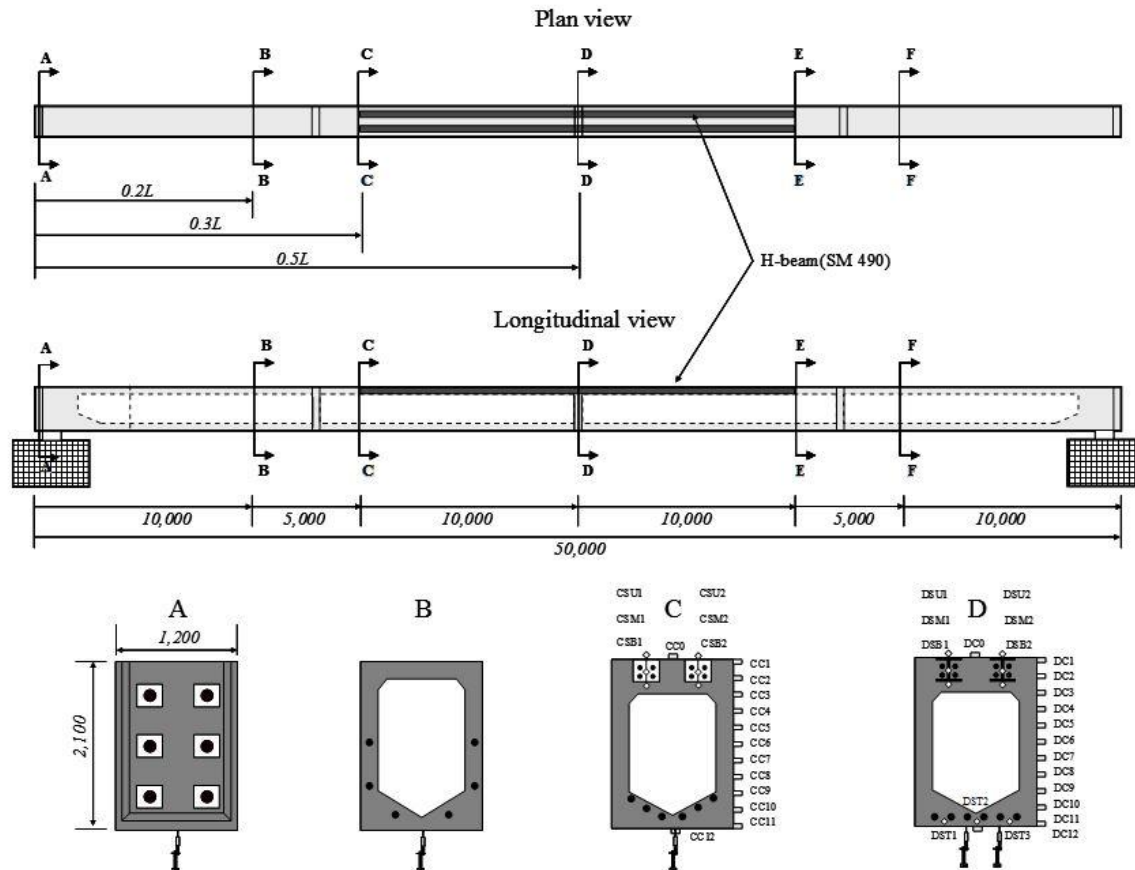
Test specimen cross-section details and gauge placement locations (unit: mm)
